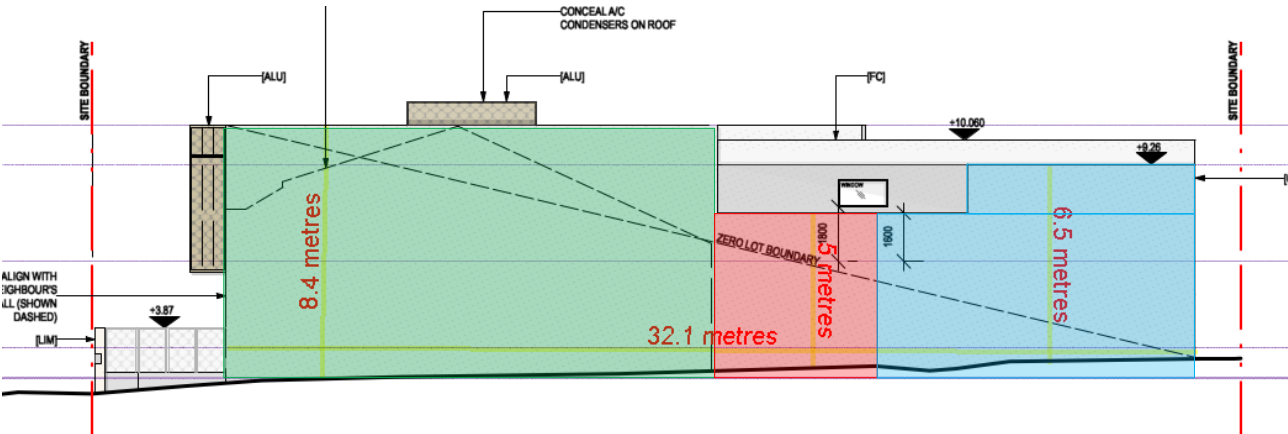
Southern Elevation showing boundary wall (green – abuts simultaneous boundary wall; red – abuts adjoining property’s outdoor living area; blue abuts common property access way and carport)
